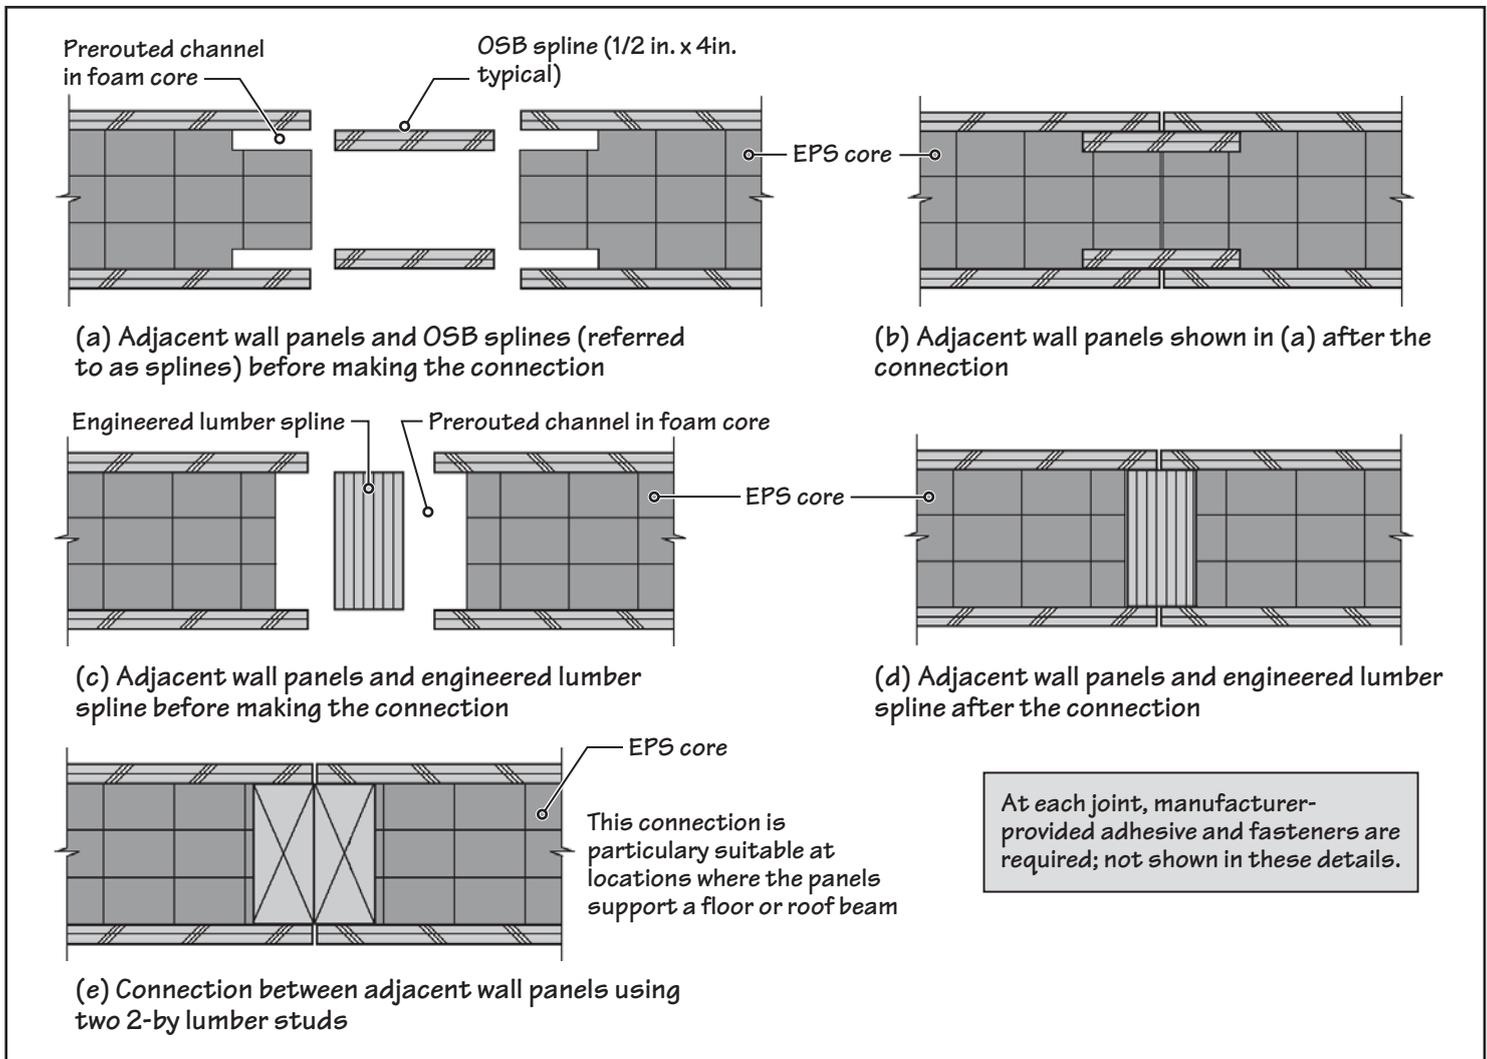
Three commonly used alternative ways of connecting adjacent wall panels. These details are keyed to Figure 17.4.
